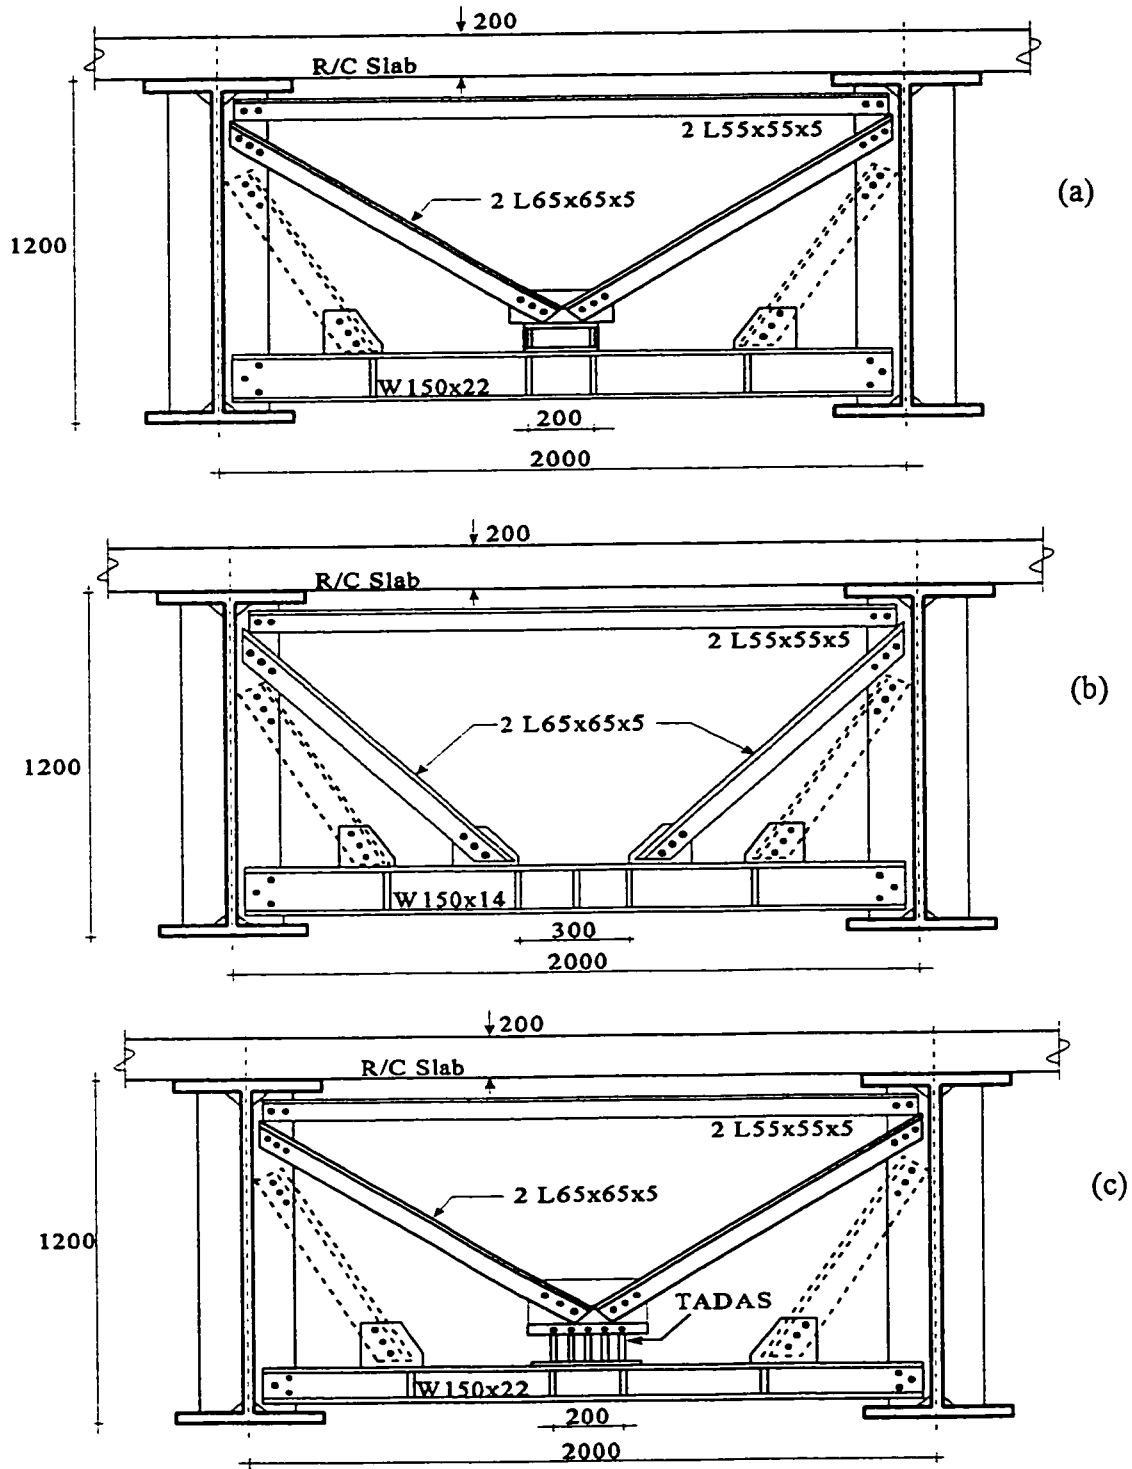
Proposed ductile end-diaphragms of a typical 40 m span bridge with: (a) TADAS; (b) EBF; (c) SPS (other unbraced girders not shown); dotted members only if required for jacking purposes for non-seismic reasons).
